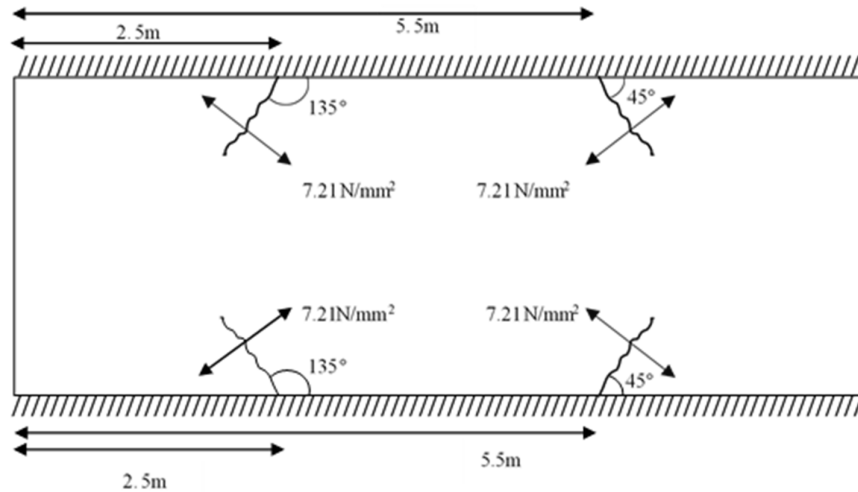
Observed possible crack pattern - 8m wall with top and bottom restraints
